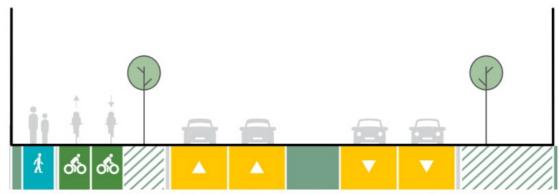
Typical rural cross section 35m - Access Road (south of Wookey Lane)
